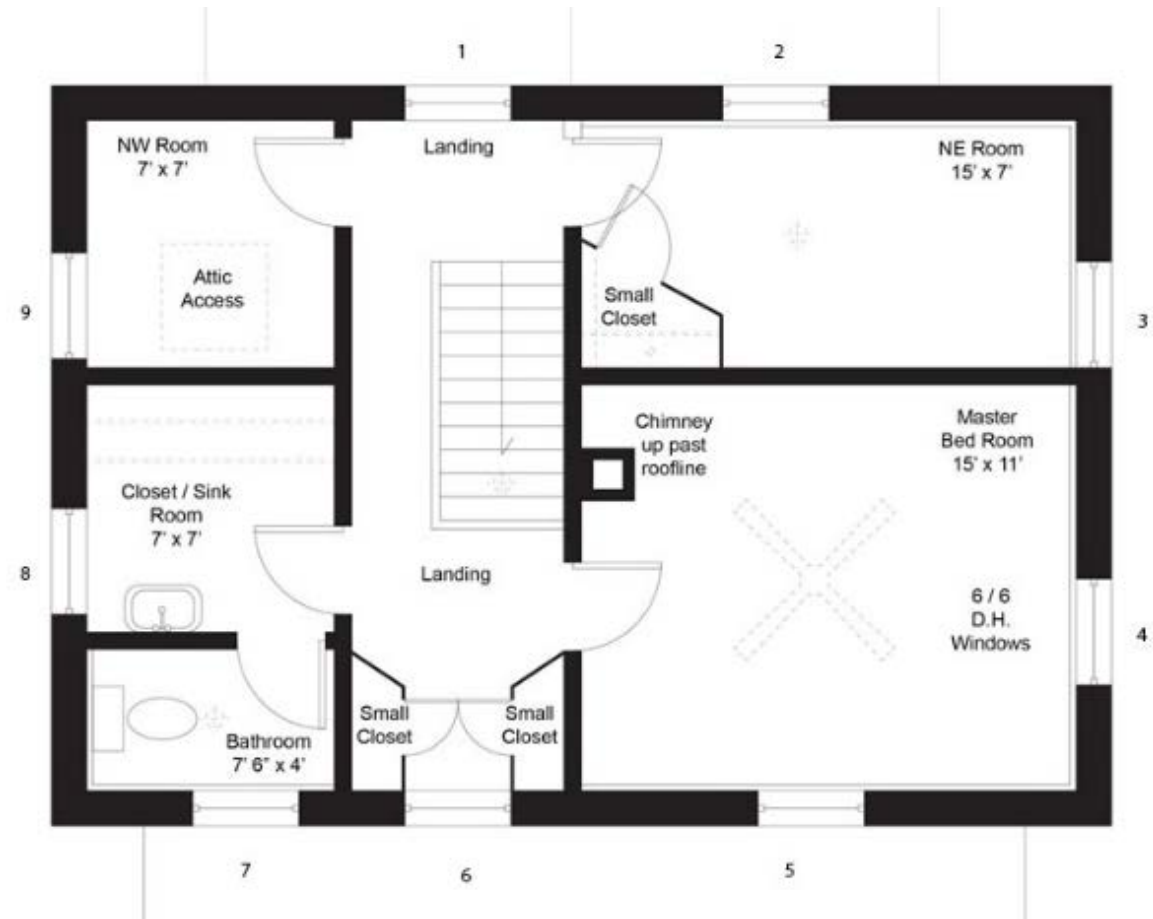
Second story floor plan of the Peterson farmhouse. The numbers correspond to the windows pictured below. Window #1 is not original. North is up.
